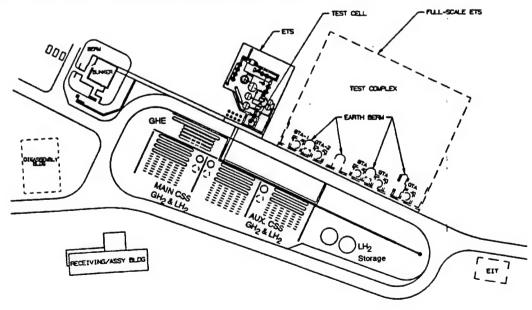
Saddle Mountain Test Site, PIPET and Expansion to Full-Scale Test Facility
